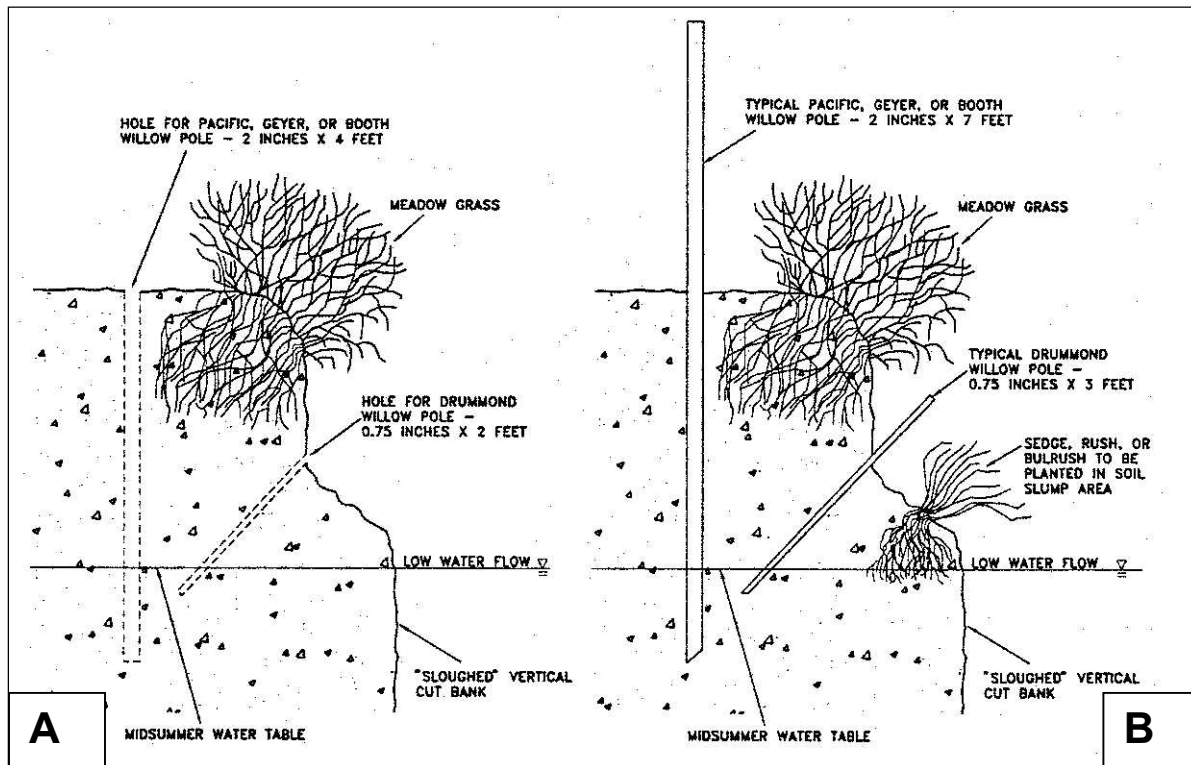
Typical planting details for placing dormant willow pole cuttings. Holes are drilled vertically or at a 45-degree angle into the streambank to a depth below the midsummer water table (A). Geyer and Pacific willow poles are planted on top of bank; Drummond willow poles are planted at an angle into the vertical outside bank, and herbaceous wetland plants are placed into soil slump areas (B) (adapted from RME, 1997).
